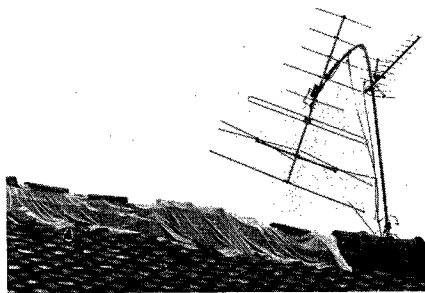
Bending television antenna on a house, Yanagi, SEKI.
